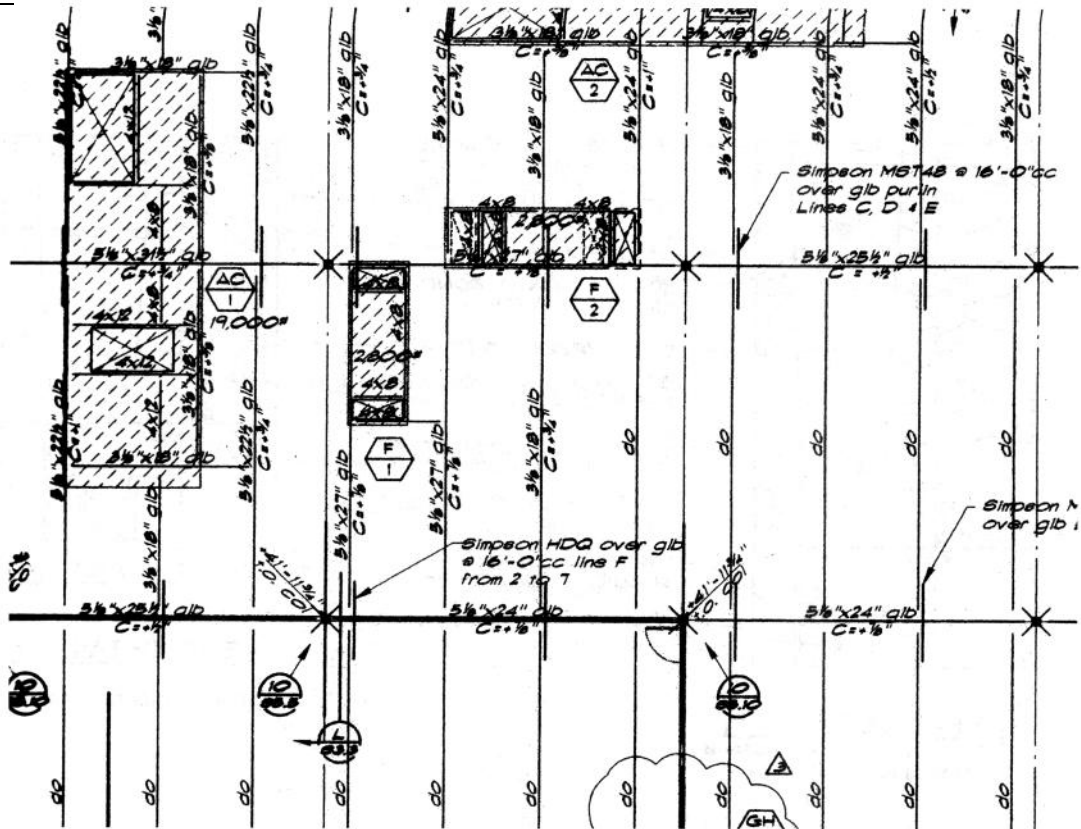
This partial roof framing plan shows the glued-laminated girder and beam system. Note the weight of AC unit 1 and how the structural engineer has addressed the additional loading where mechanical equipment is supported by the roof. (Drawing courtesy of Buehler and Buehler Structural Engineers.)
